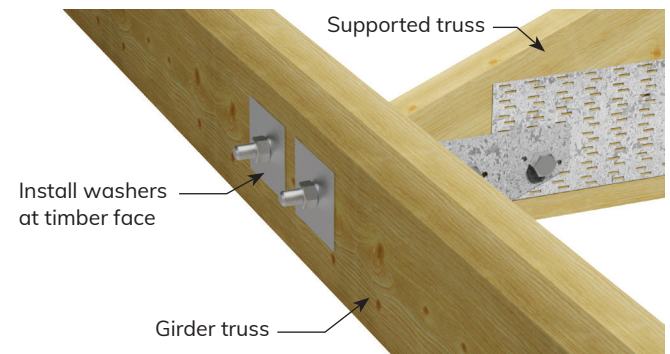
Multi Girder Bracket - Bolt Option, Back View
